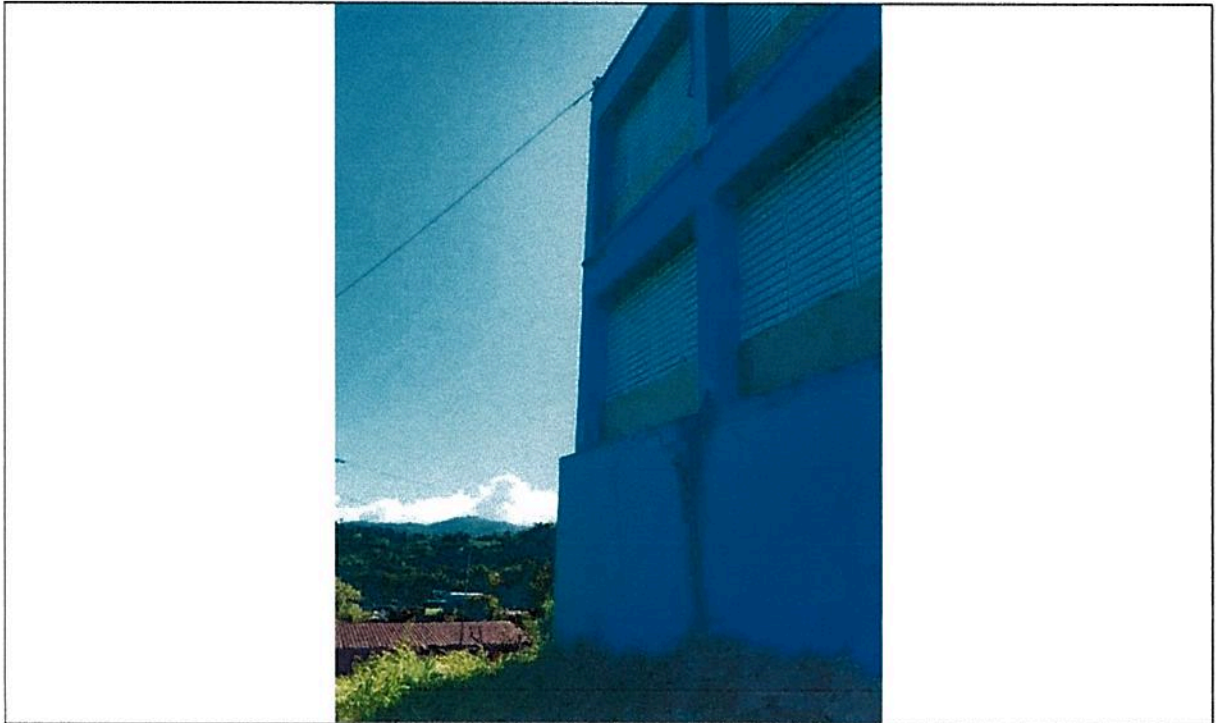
Wide cracks (horizontal and vertical) at CMU wall under North-East part of the building. North side of the N-E corner.
